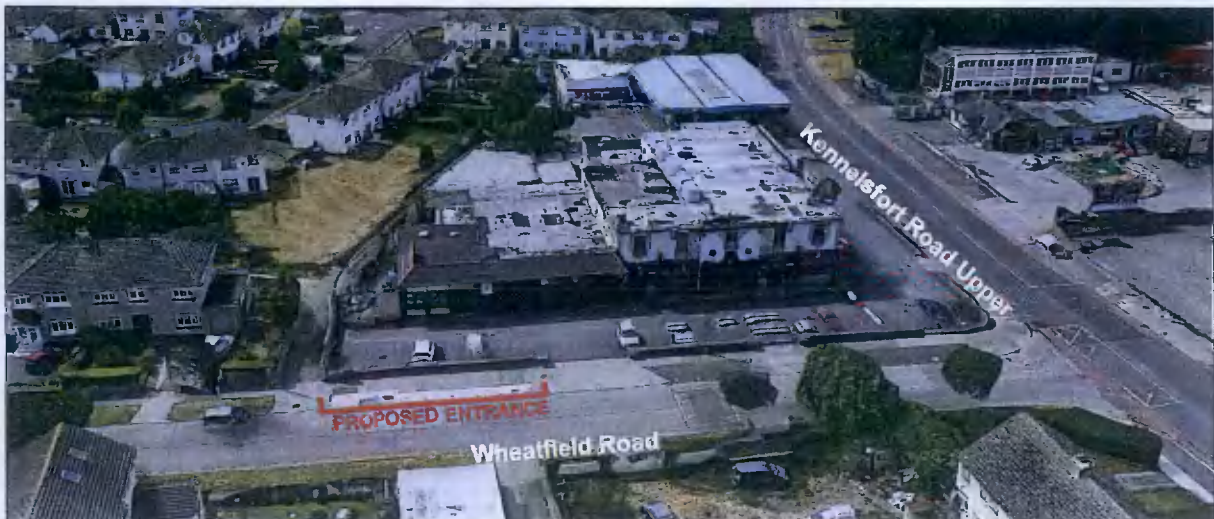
The subject site entrance proximate to the junction of Wheatfield Road and Kennelsfort Road Upper.
